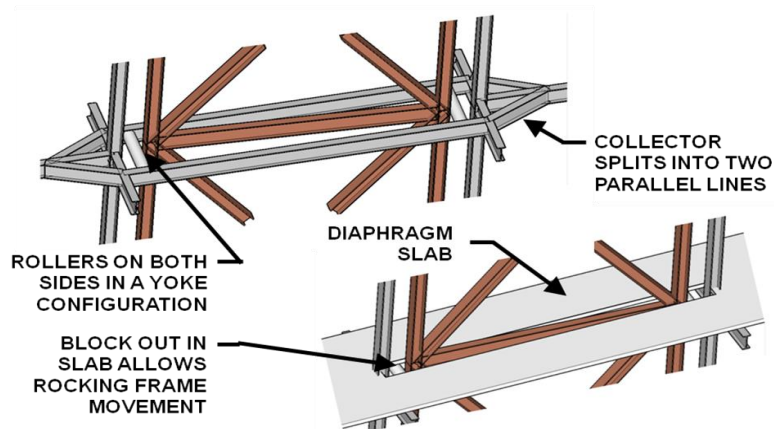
Isometric View of a Possible Diaphragm to Rocking Frame Connection Using a Yoke
